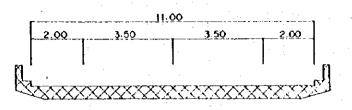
Cross Section of Bridge Deck, Special Bridge
